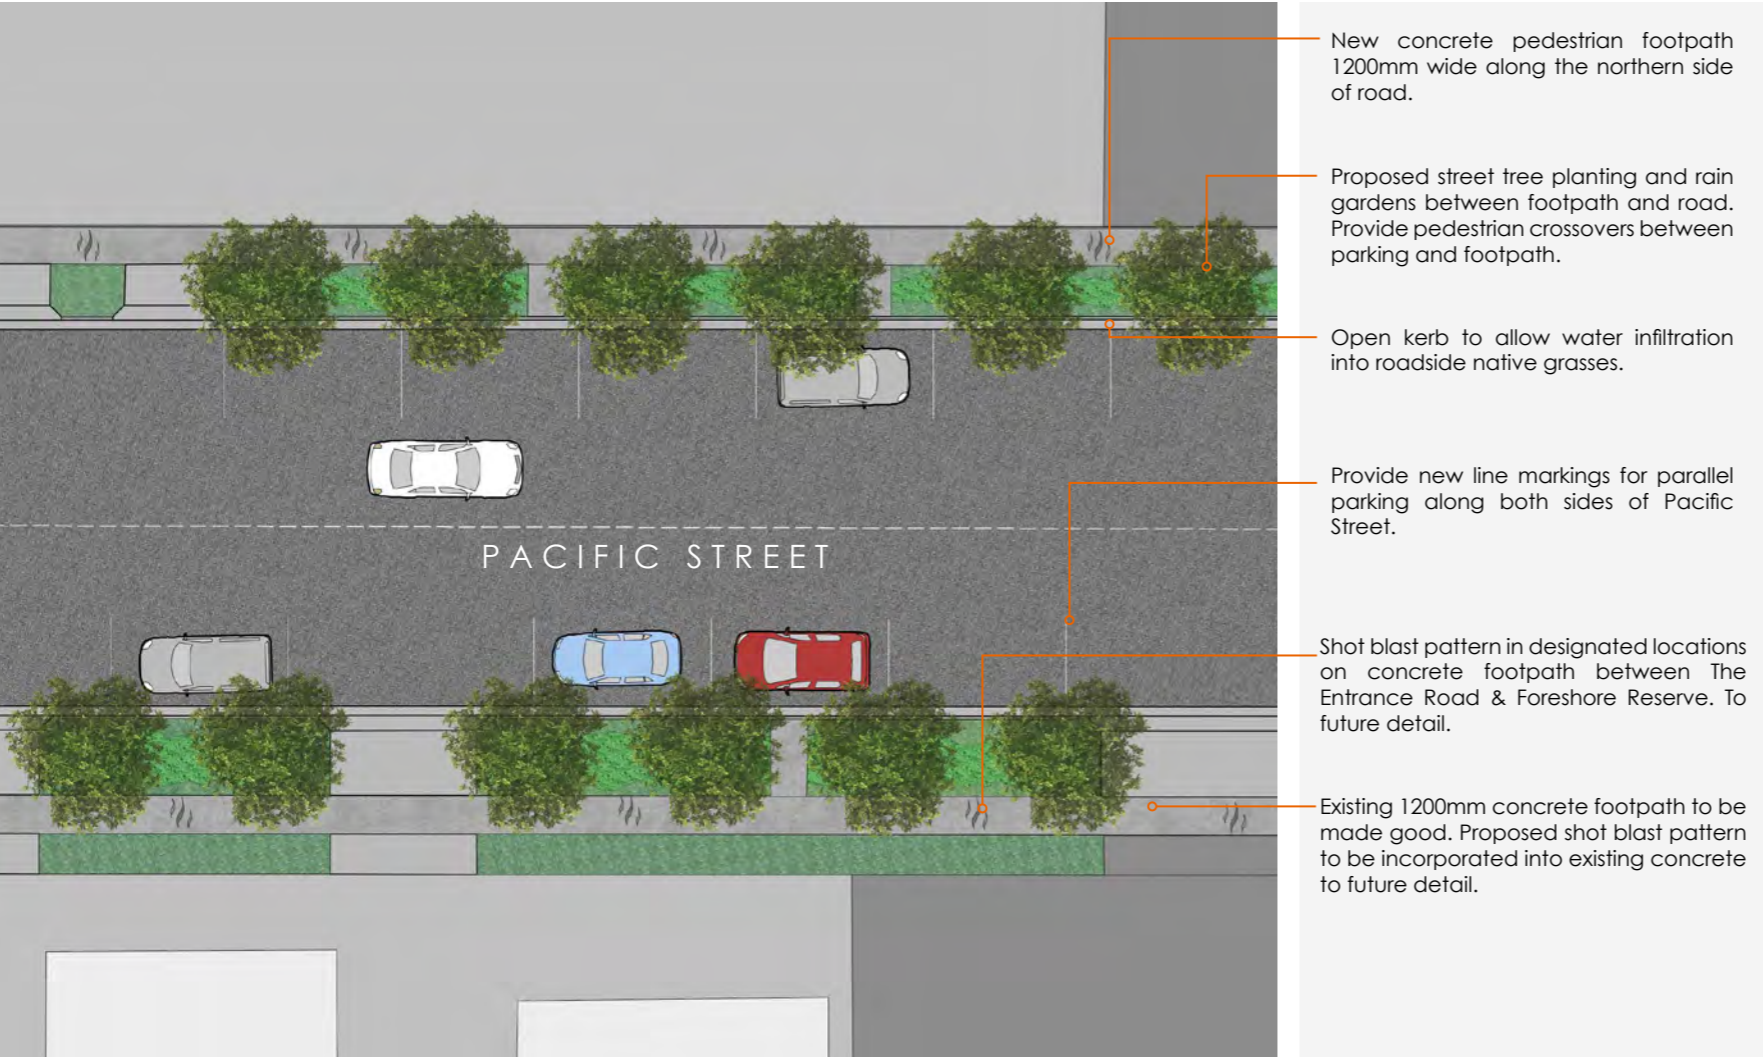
TYPICAL STREETScape DETAIL - PACIFIC STREET
